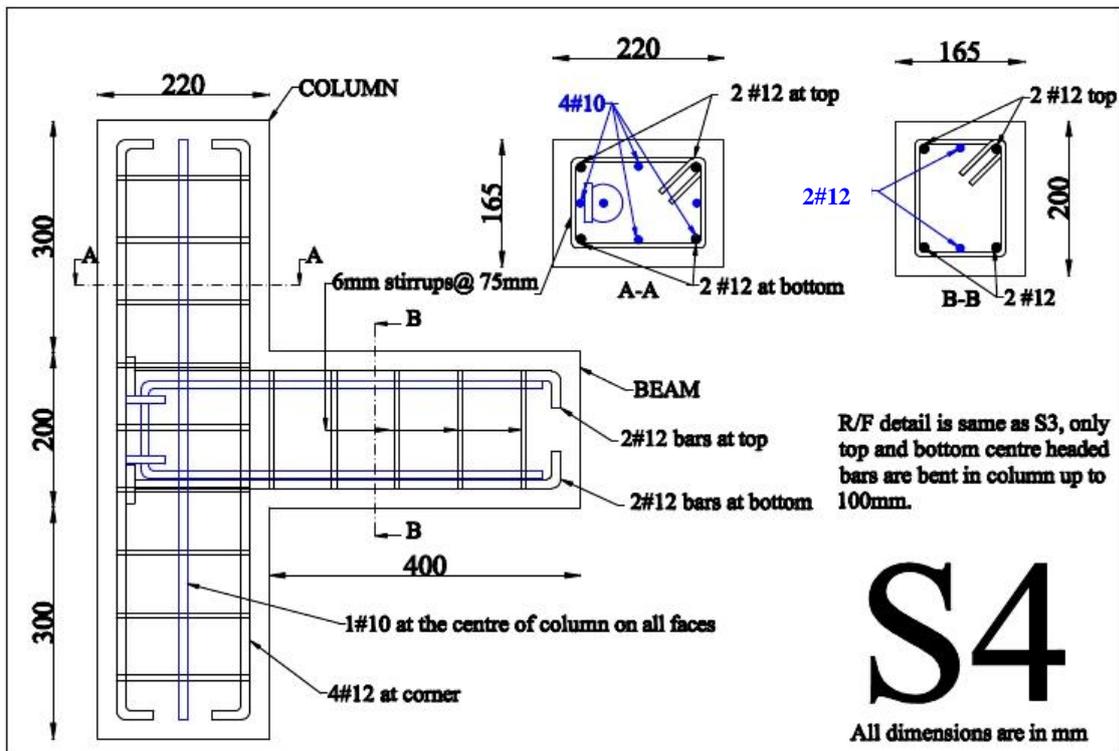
Reinforcement with headed bars (Head Plates in orthogonal planes)
